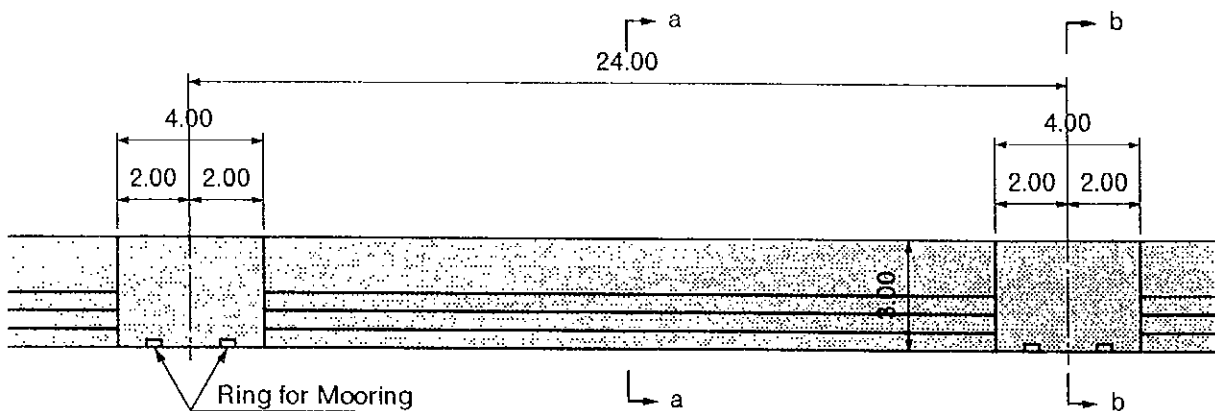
Standard Cross Section of Seawall - Type A
